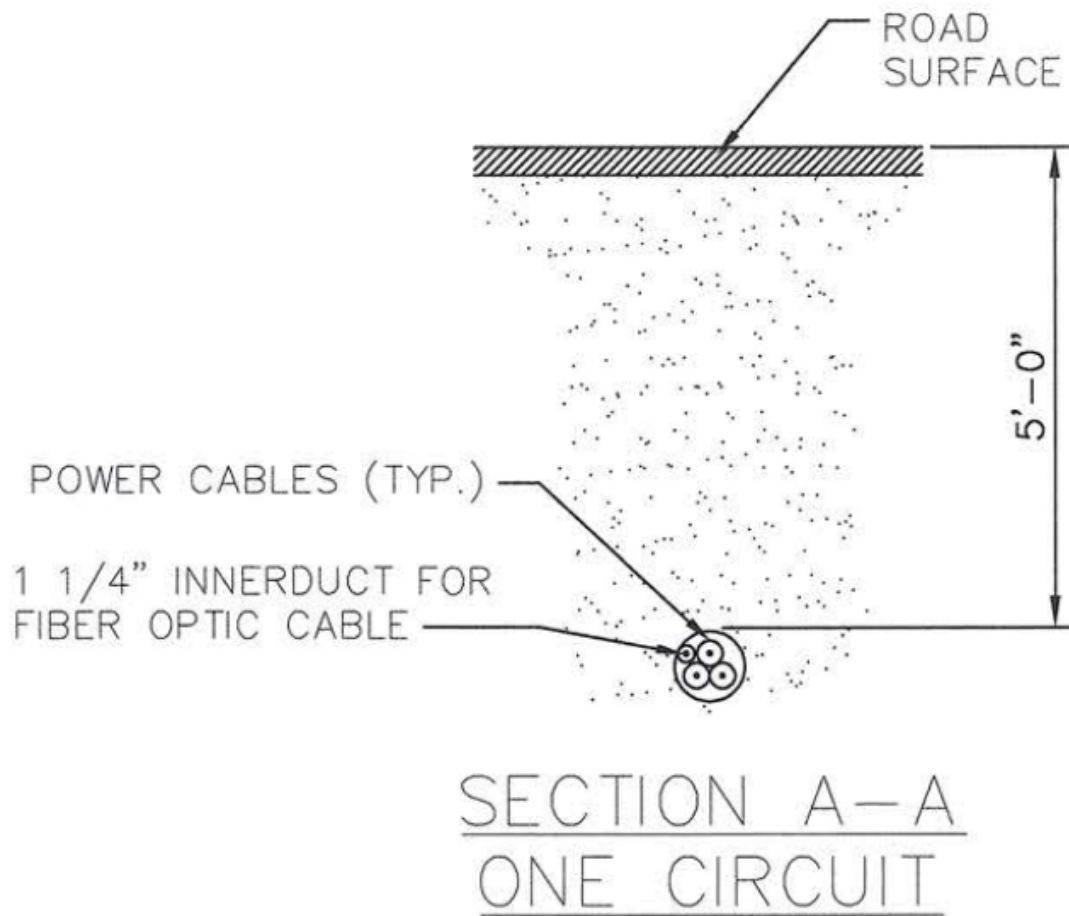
PROPOSED CROSS SECTION 3 – UNDERGROUND CABLE UNDER A ROAD CROSSING
